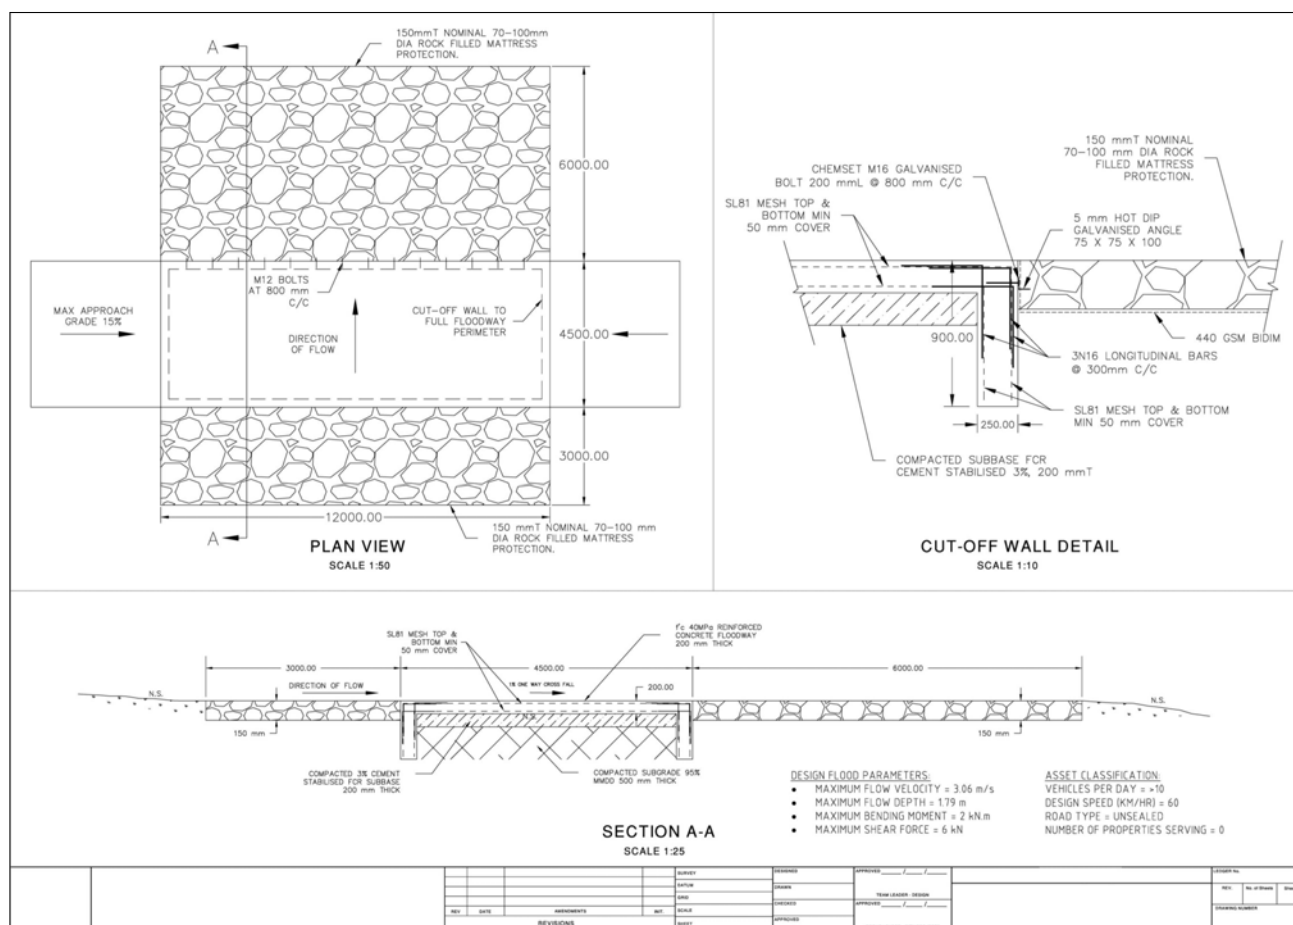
Example 4 - Category A floodway design drawing (Williams Creek).
